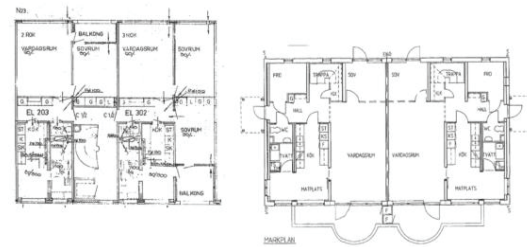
Floor plans showing a building section from the original donor building (left) and the new ground-floor plan of the semi-detached houses completed on the same site (right).
